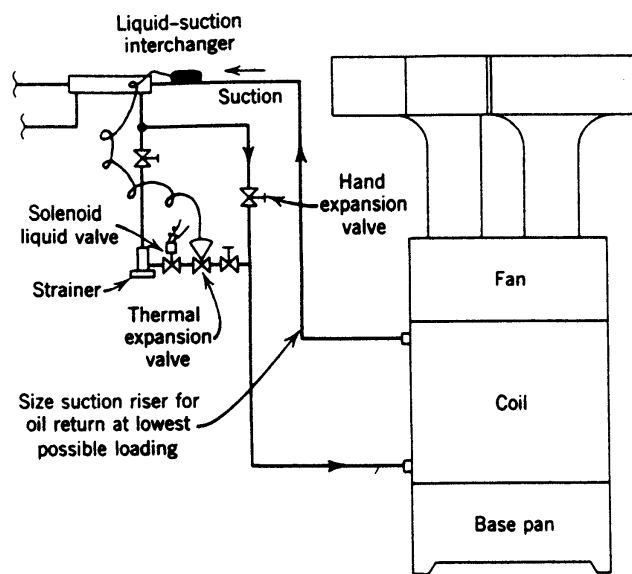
Forced circulation air cooler with direct-expansion feed of flooded-type coil. (Courtesy of Carrier Corporation.)
